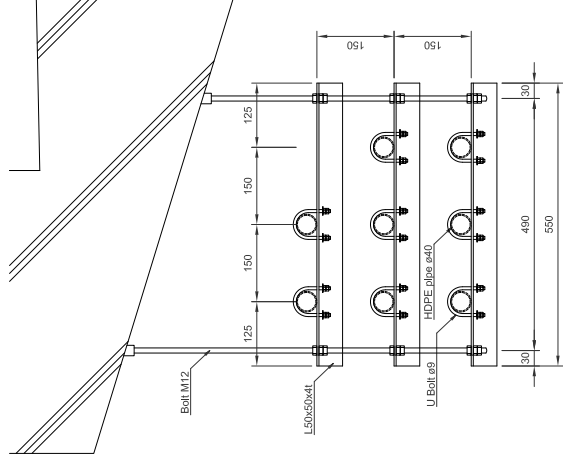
# DETAIL OF COMMUNICATION DUCT (TYPE B2) ON BRIDGE ( 1 )
